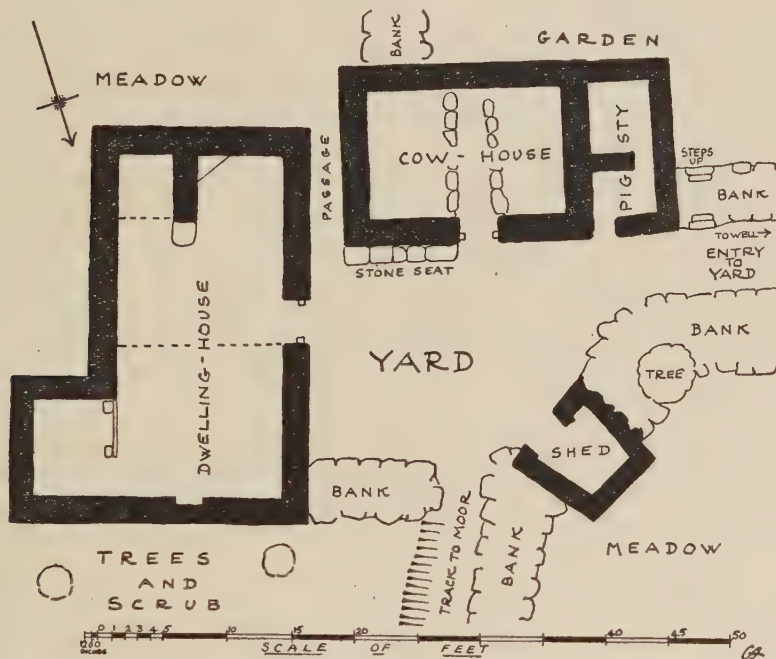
CARN-DEIFOG-ISAF: sketch plan of the Steading
